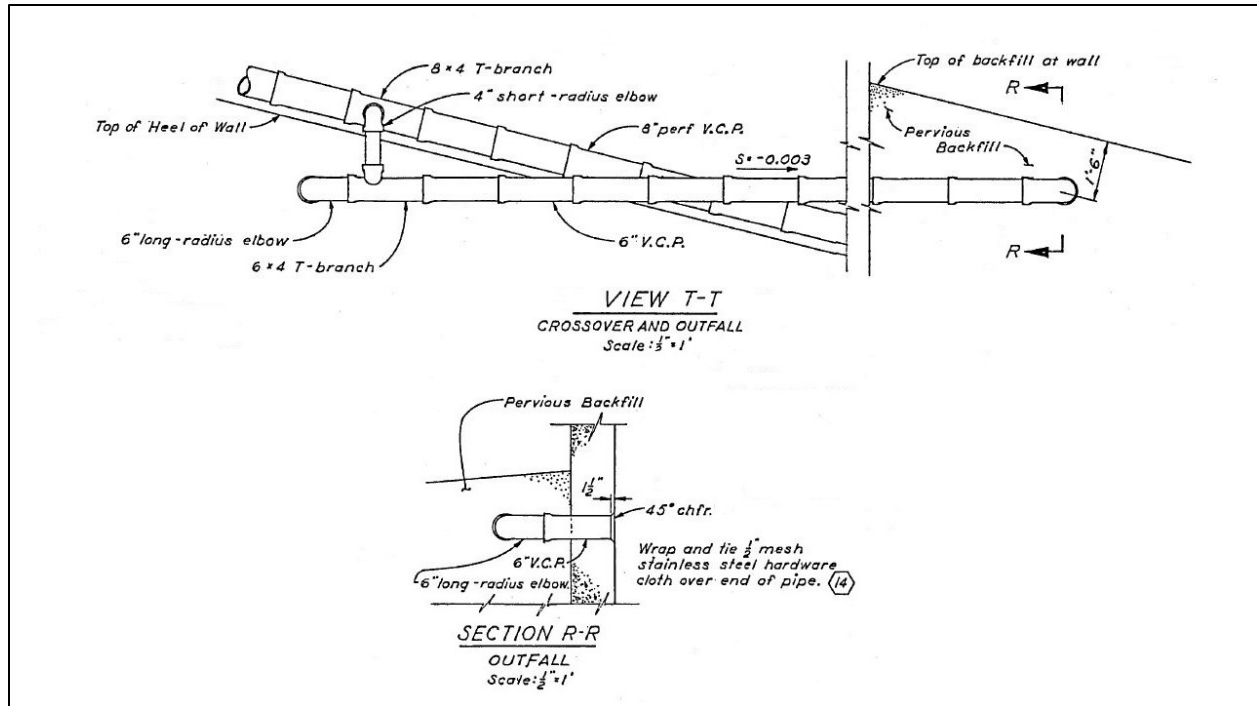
Original Collector and Backfill Drainage Details from the Bid Specifications Drawing A-3B9-1
